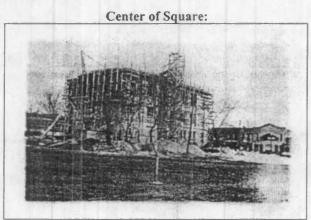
Courthouse construction photo, view northeast Note the retained trees around the new building.
